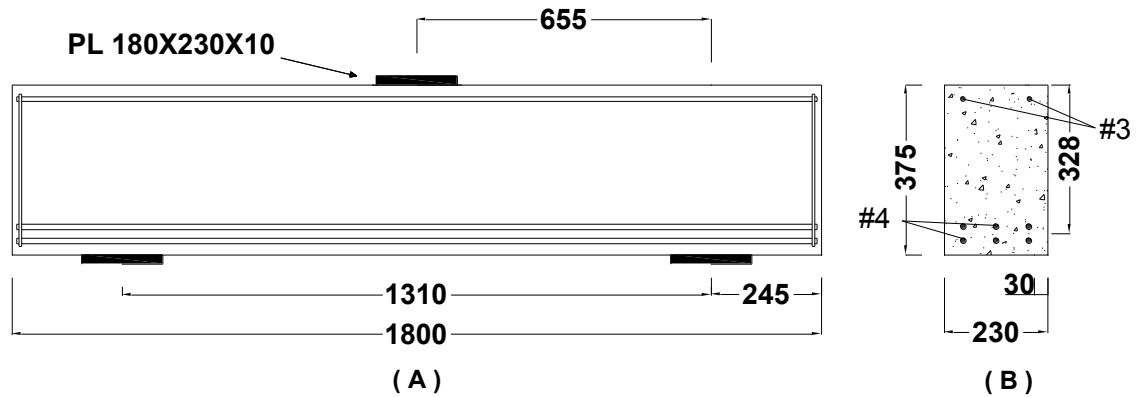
Beam C2/00: (A) elevation (B) cross section
